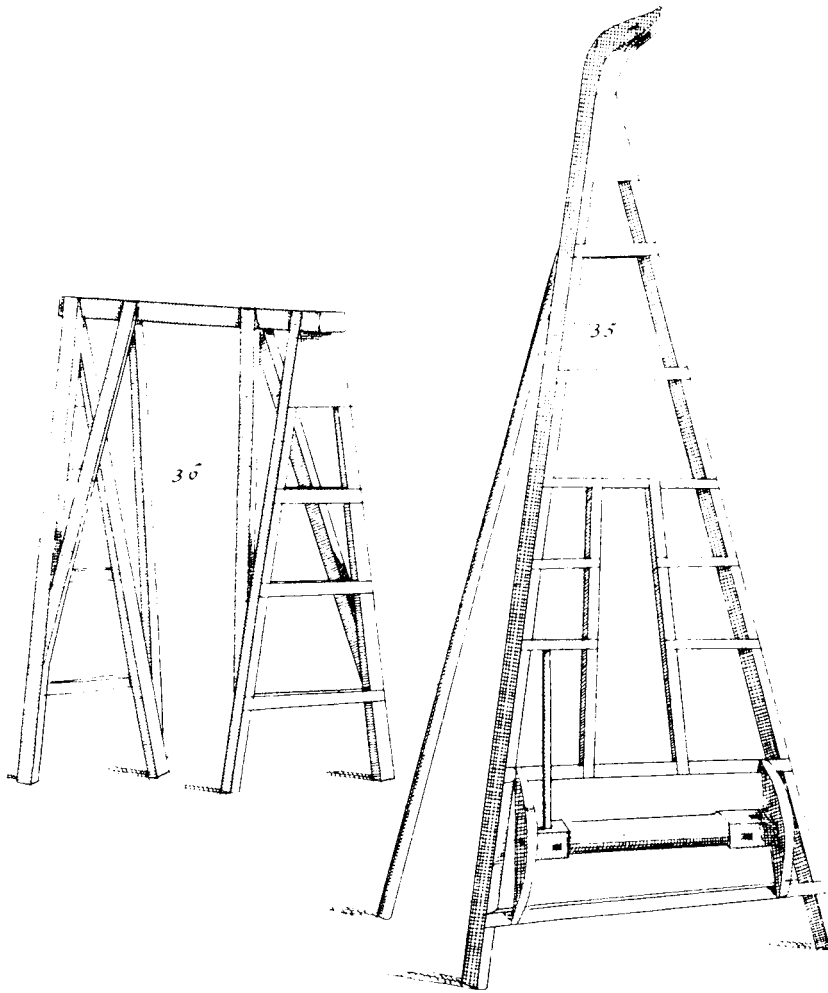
PLATE LXXV (left) (1851/44) 35. A gin. 36. A trestle. There should also be a measuring rod of 20 feet [measuring rod shown as 34].
